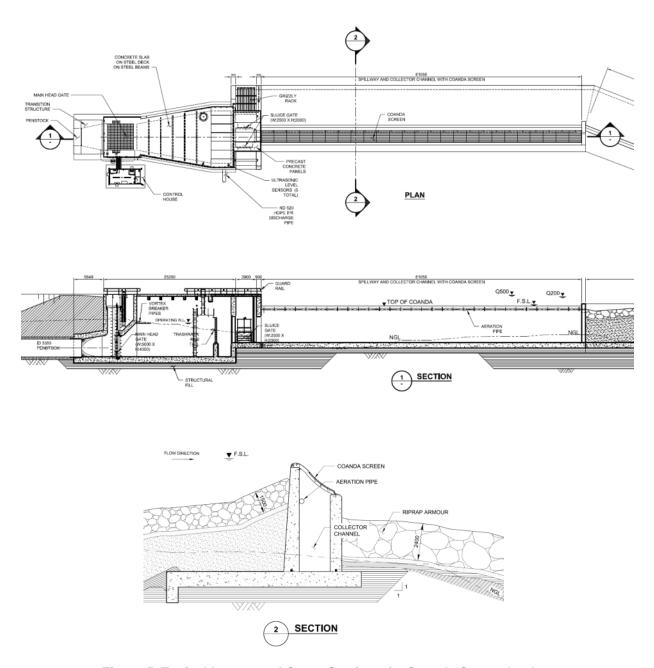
Typical Layout and Cross Section of a Conada Screen Intake
